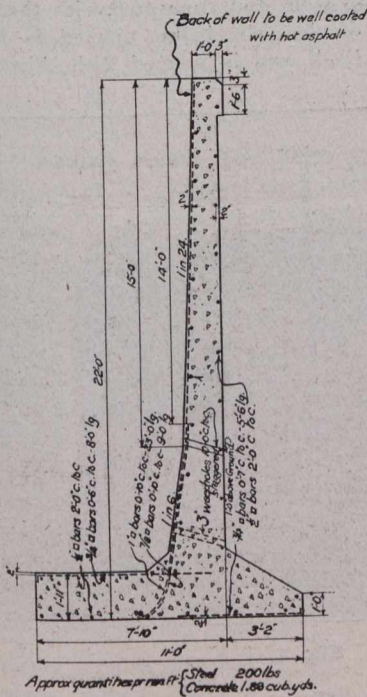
Typical Section of Retaining Wall at Deepest Point.
